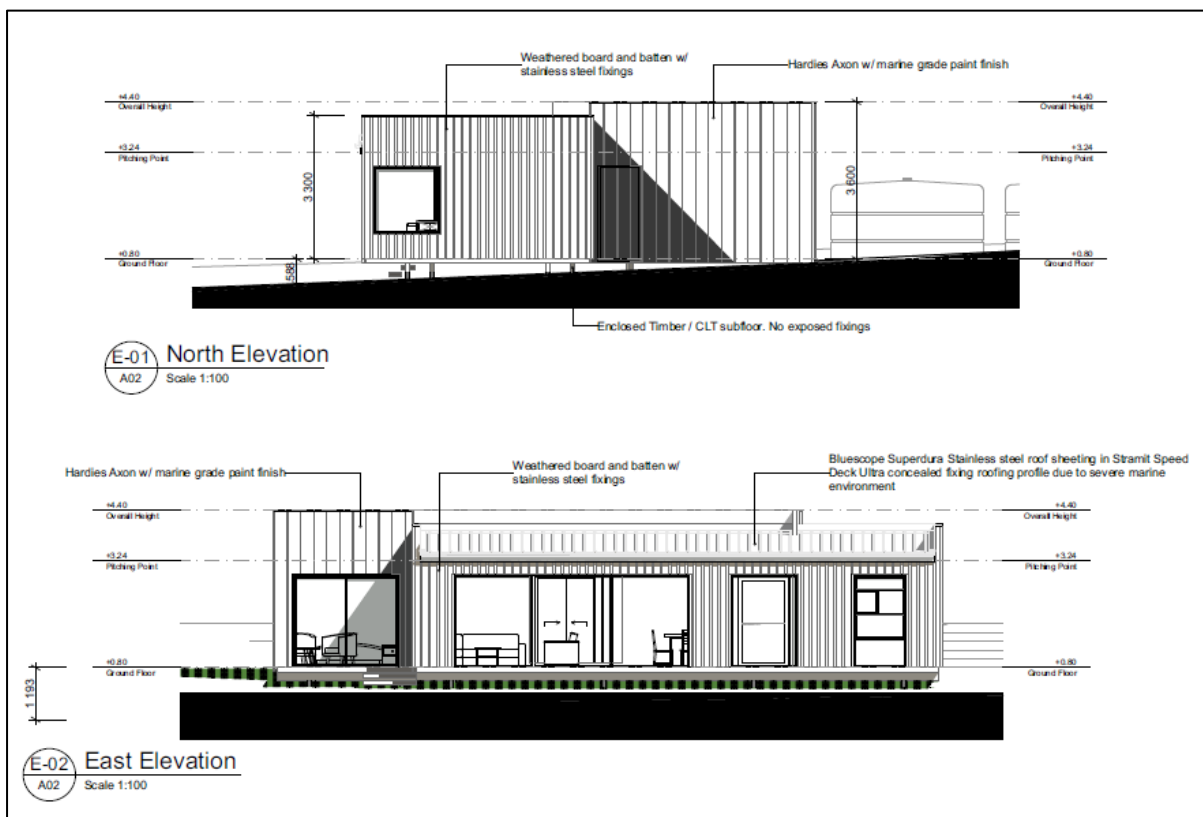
Elevation Plans – New Dwelling (Source: Spectura Studio).
